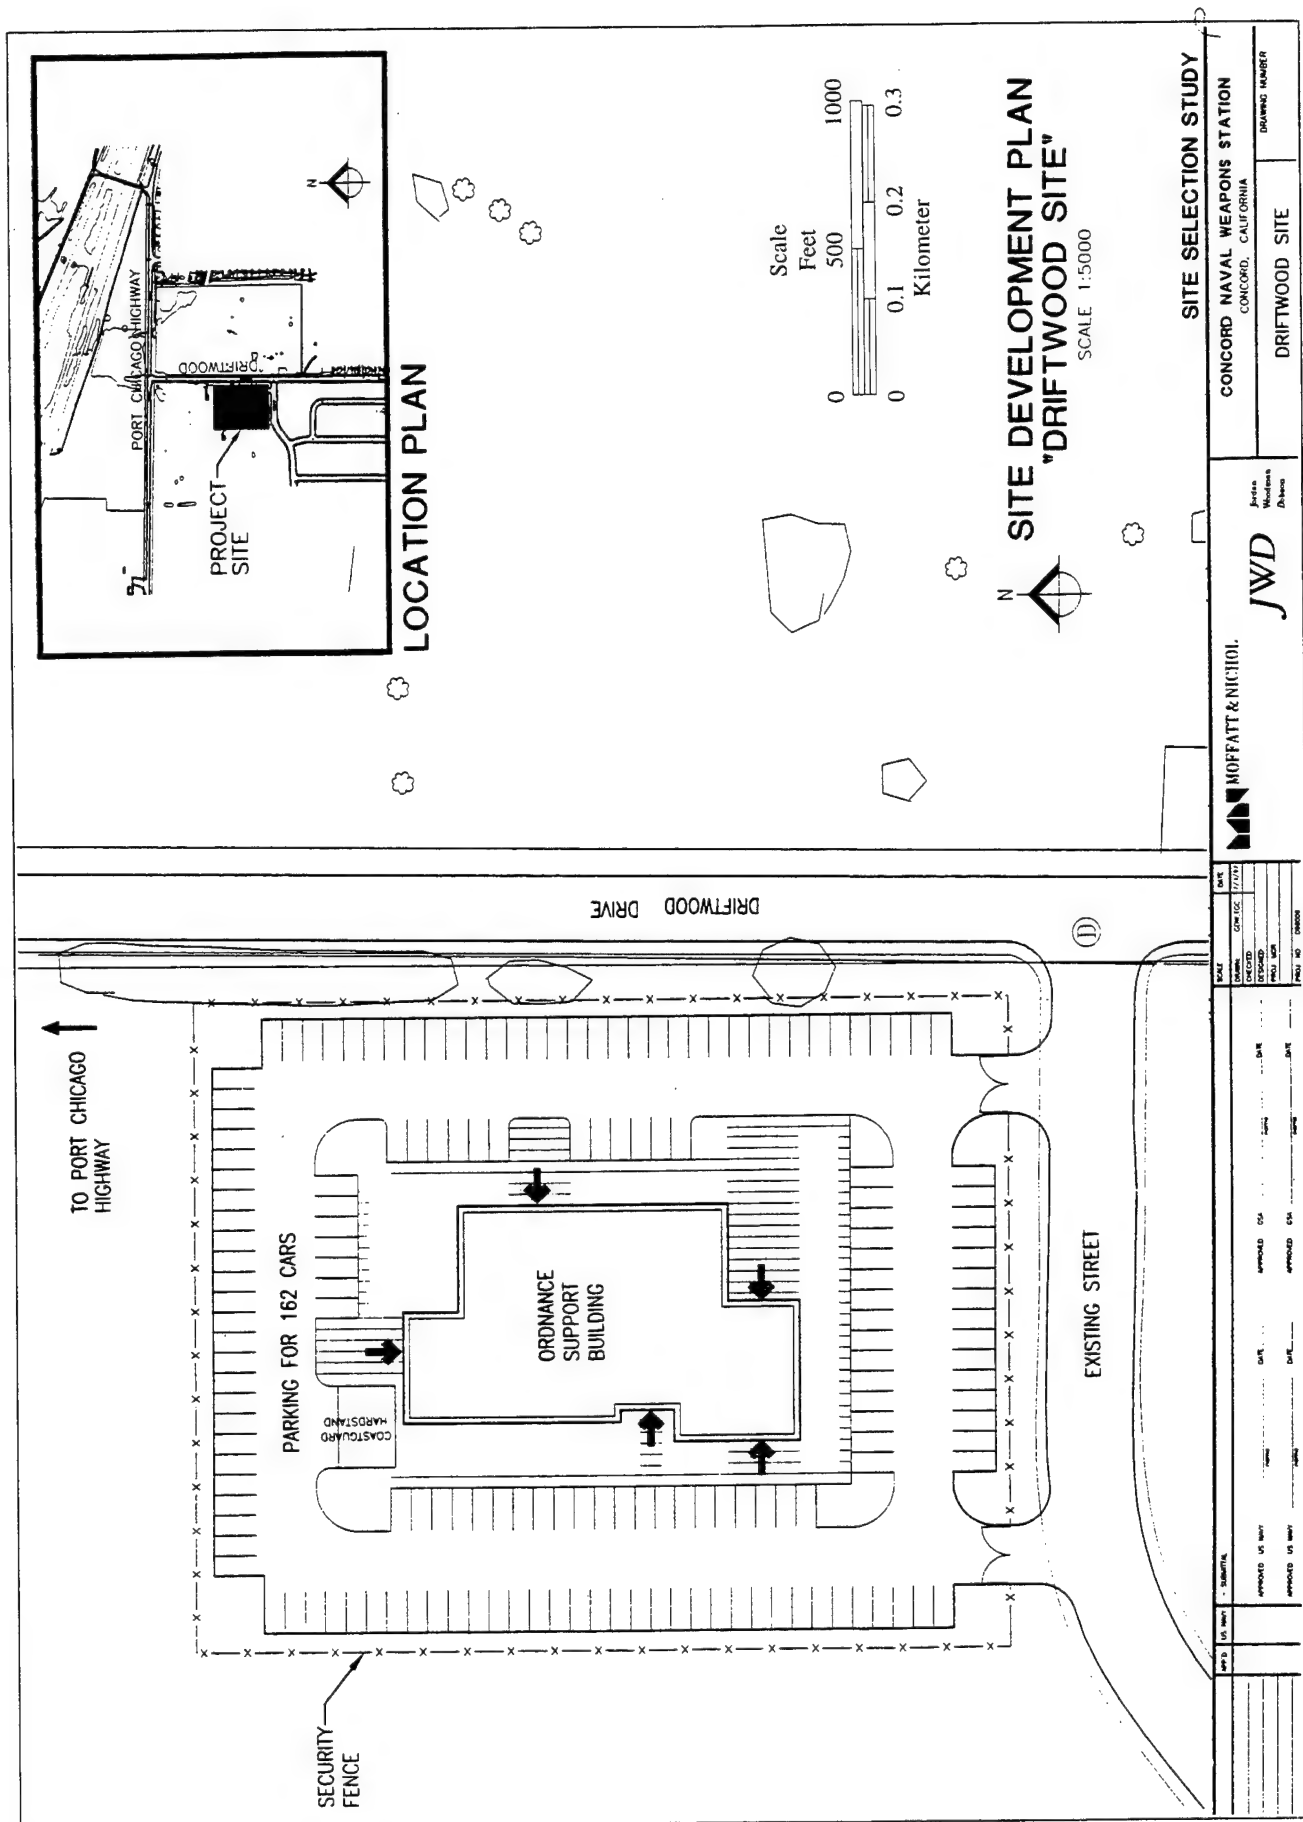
Preliminary Site Development Plan - Driftwood Drive Site
